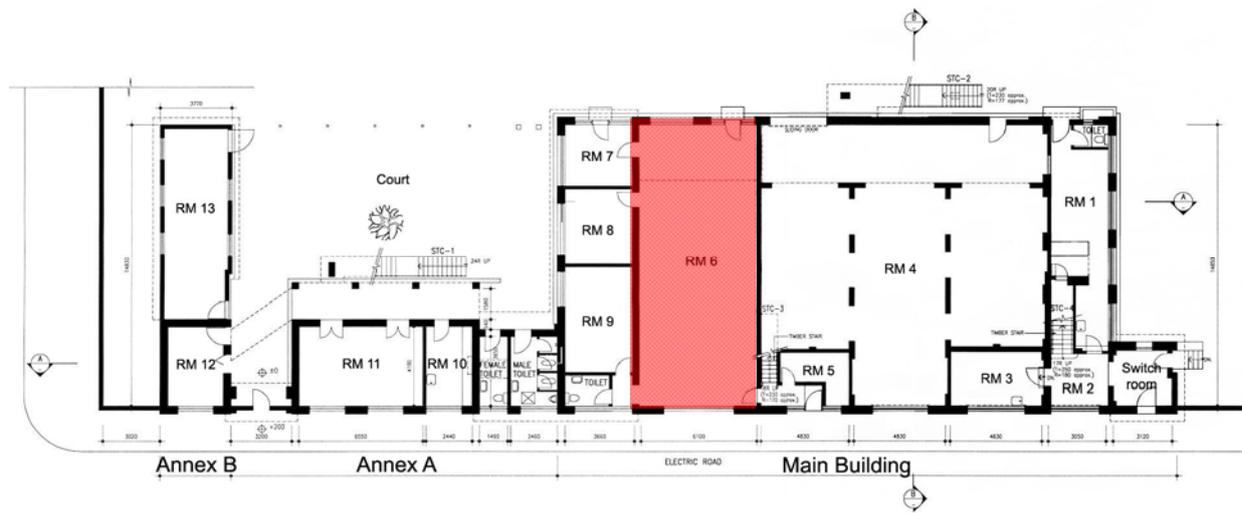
Location of RM 6 on the ground floor at the former clubhouse (1:400).
